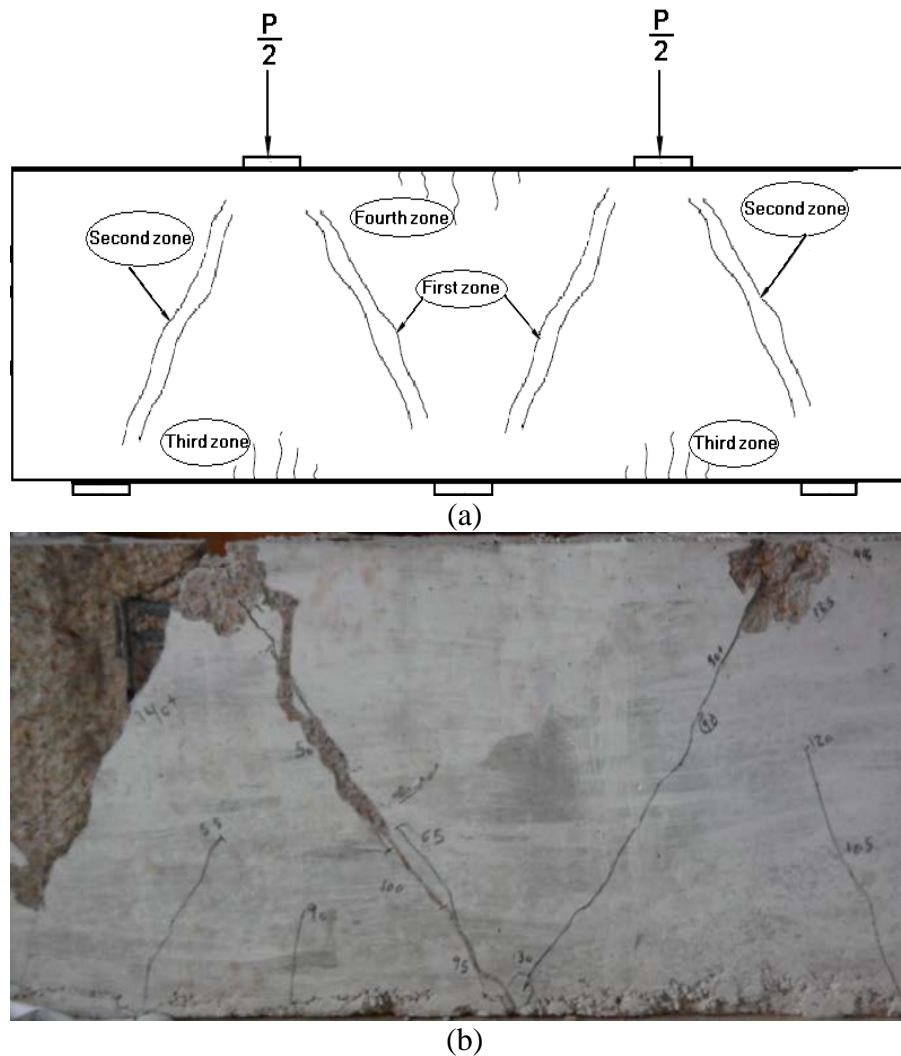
Typical cracking of continuous solid deep beams and crack pattern of beam NS
